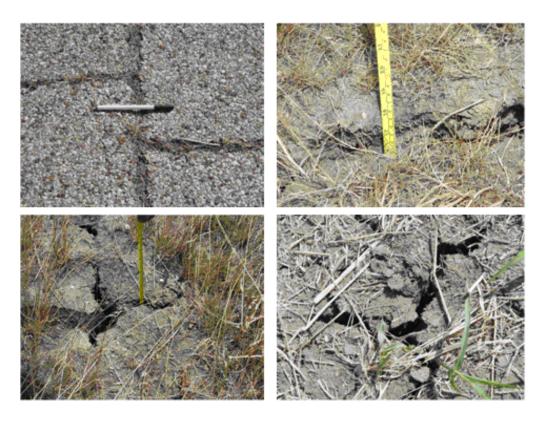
Cracks noticed on the crest and slope of Joe Pool Dam outside test sections
